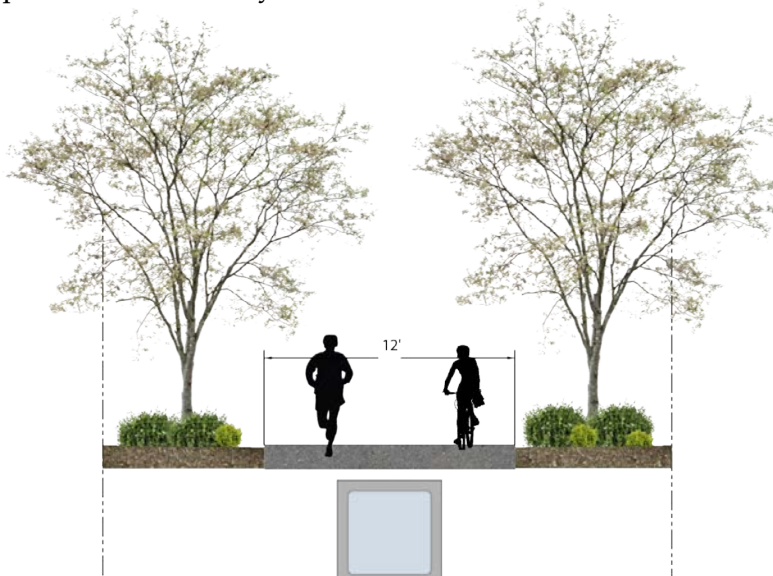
East Jordan Canal Trail typical sections of trail over canal enclosure.
